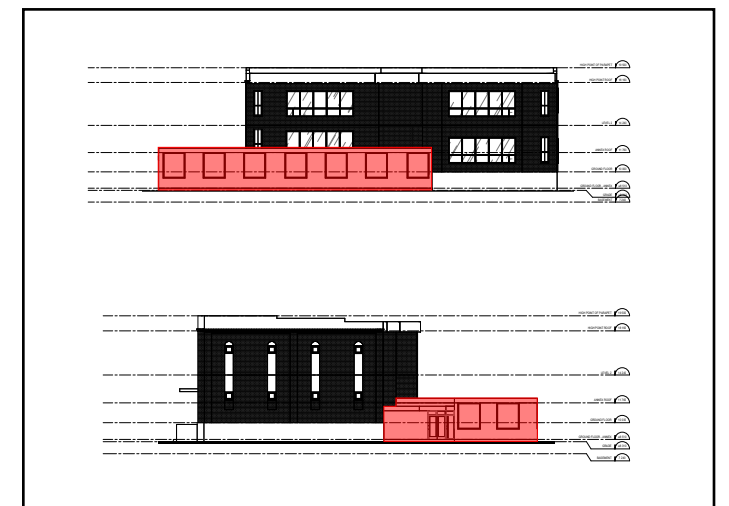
Northwest and southeast elevations of proposed demolition. EVOQ.
